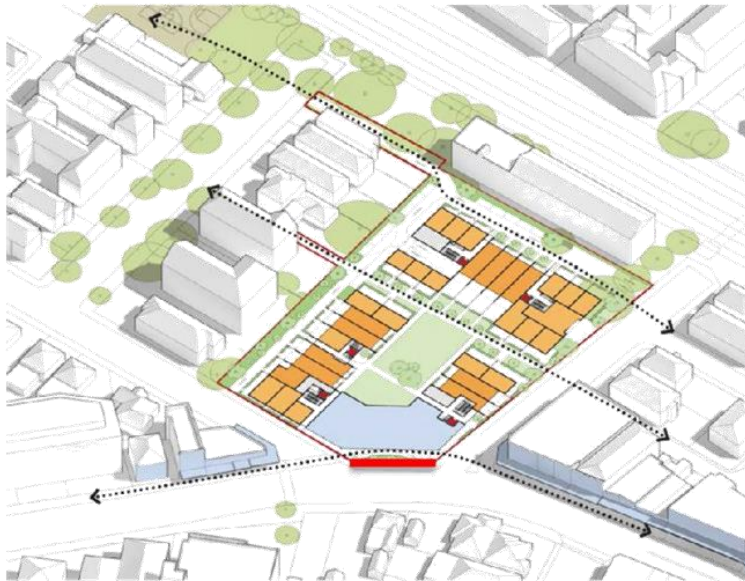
Minor corner frontage of the Site to Liverpool Road (highlighted in red)
